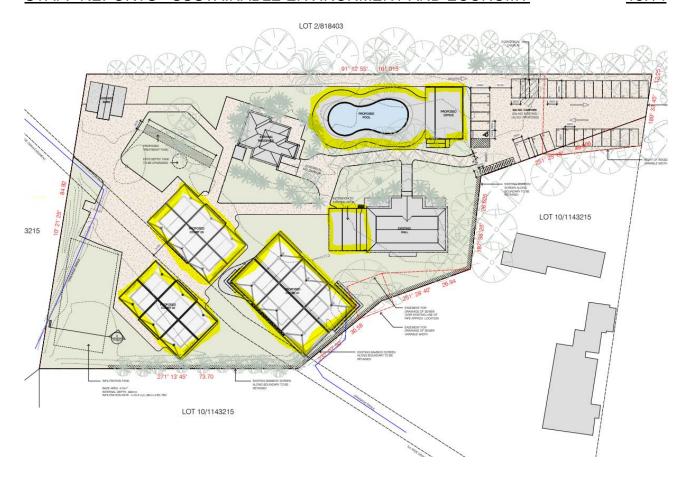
Extract of Site Plan for subject application with additions/ expansions highlighted yellow
